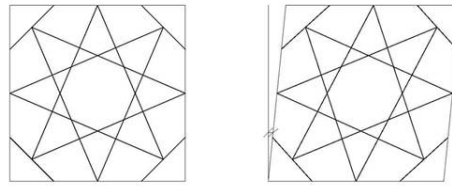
Plans of Torres del Río (left) and Almazán (note the slight skew of the plan)
